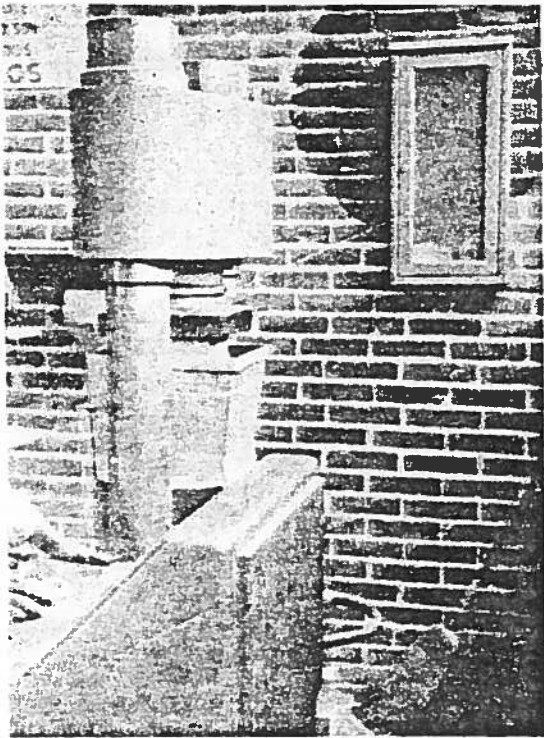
COMPRESSION TEST OF CONCRETE BLOCK SAMPLES
